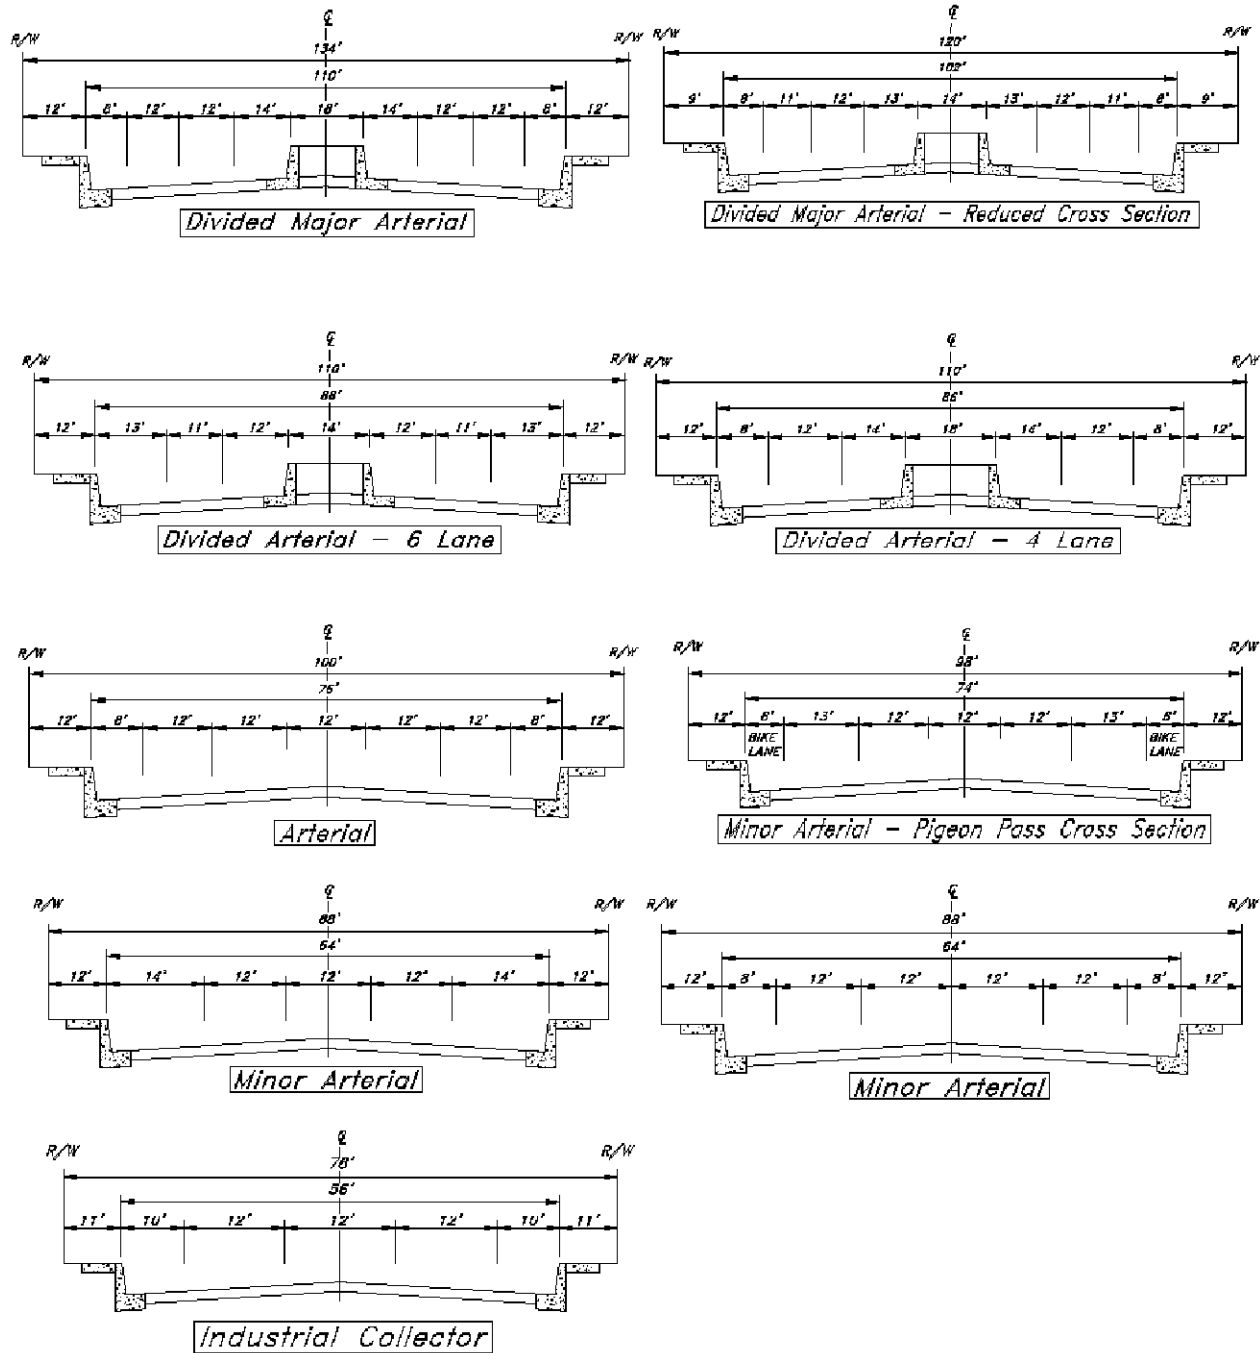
CITY OF MORENO VALLEY GENERAL PLAN CIRCULATION ELEMENT
